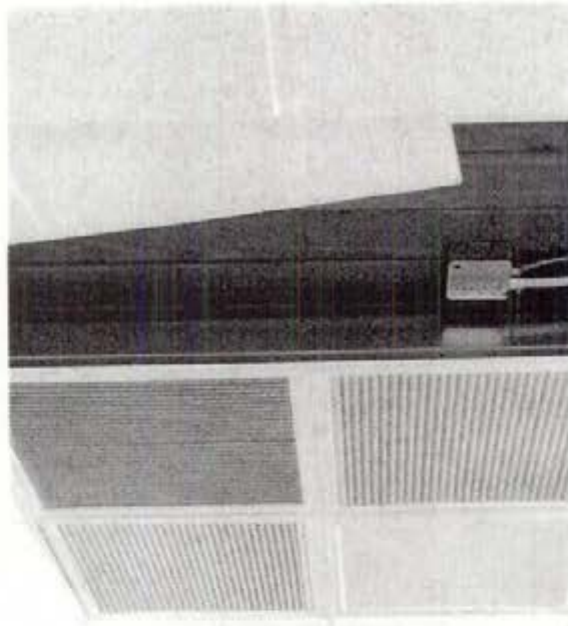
Newly installed ceiling vent in the hallway drop-in ceiling.
